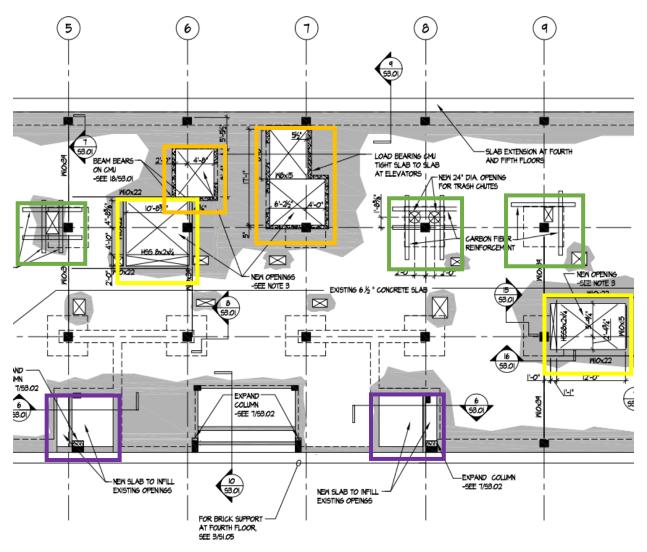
Portion of Typical Floor Plan Shown where Modifications to slab and layout occur in original building's slabs, S1.05
